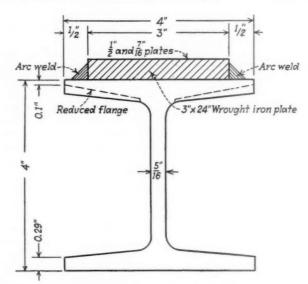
Illustrating the Manner in Which the Tested Beams We:@ Prepared by Reducing the Flange and Welding on a Wrought Iron Plate
